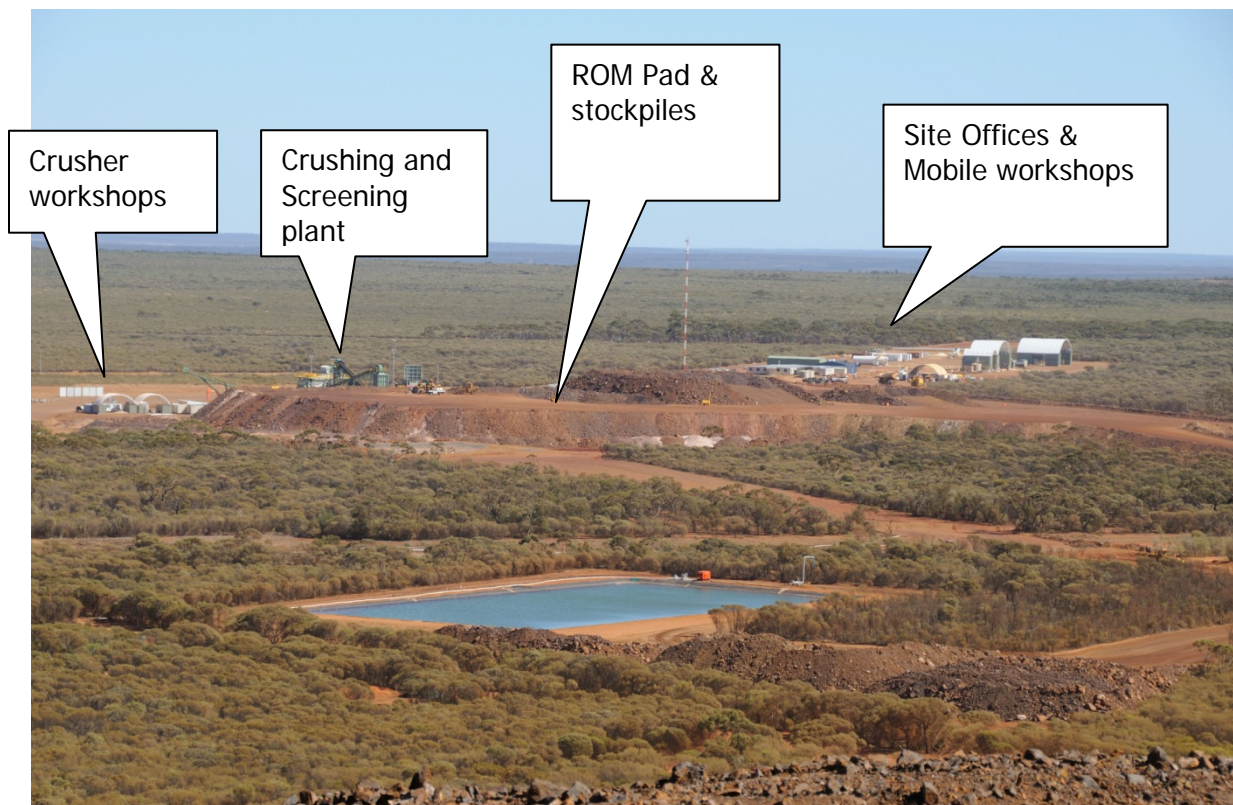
Site facilities looking west from the pit floor showing (left to right) crusher workshops, crushing and screening plant, ROM pad with commissioning and ore stockpiles, site offices and mobile workshops
